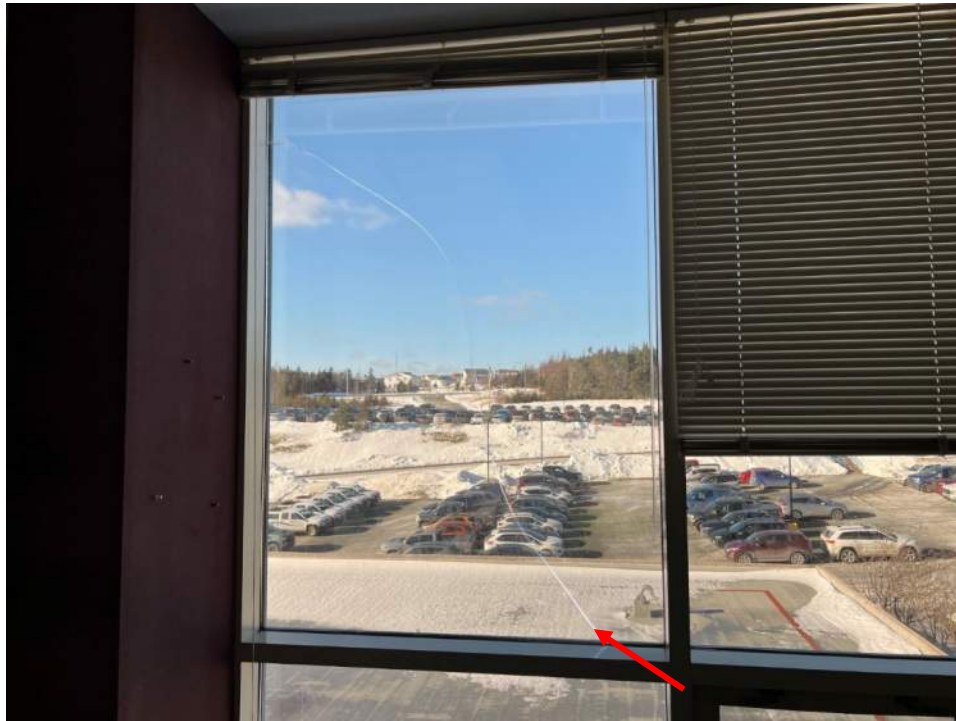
Typical view of cracked and showing an annealed breakage pattern windows (red arrow)
